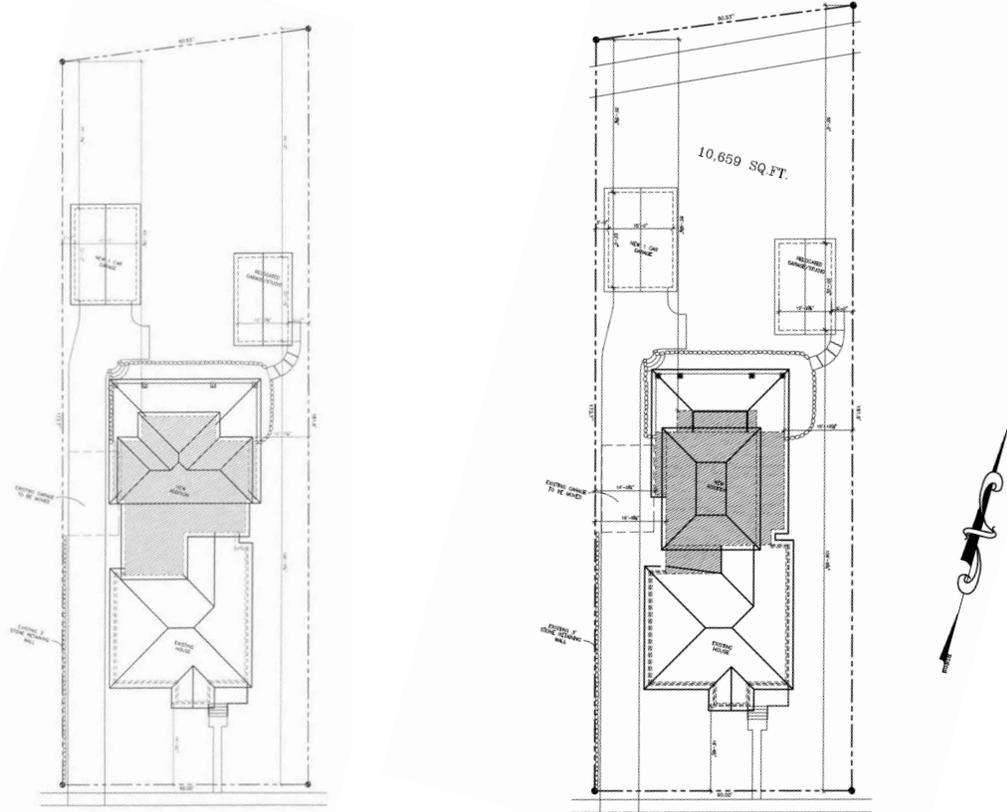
July 2nd, 2014 (left) and Sept. 3rd Site Plans (right). Not to scale.
